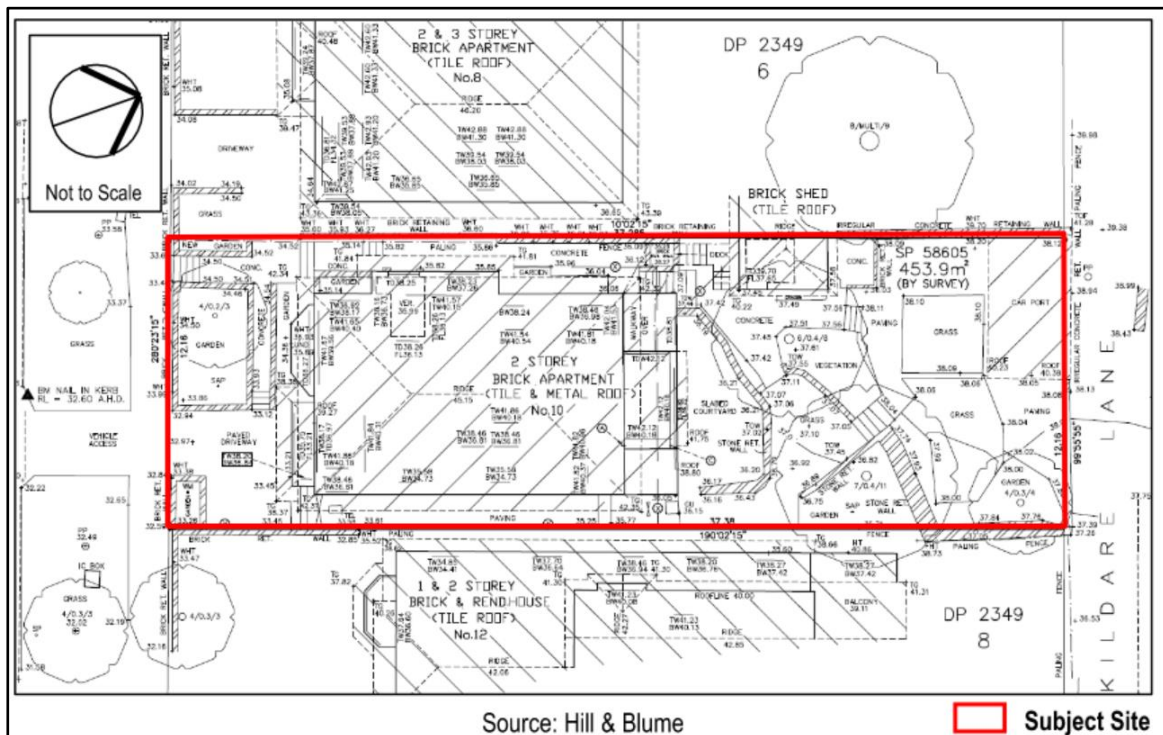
Survey Plan of No. 10 Moore Street (Source: Hill and Blume)
